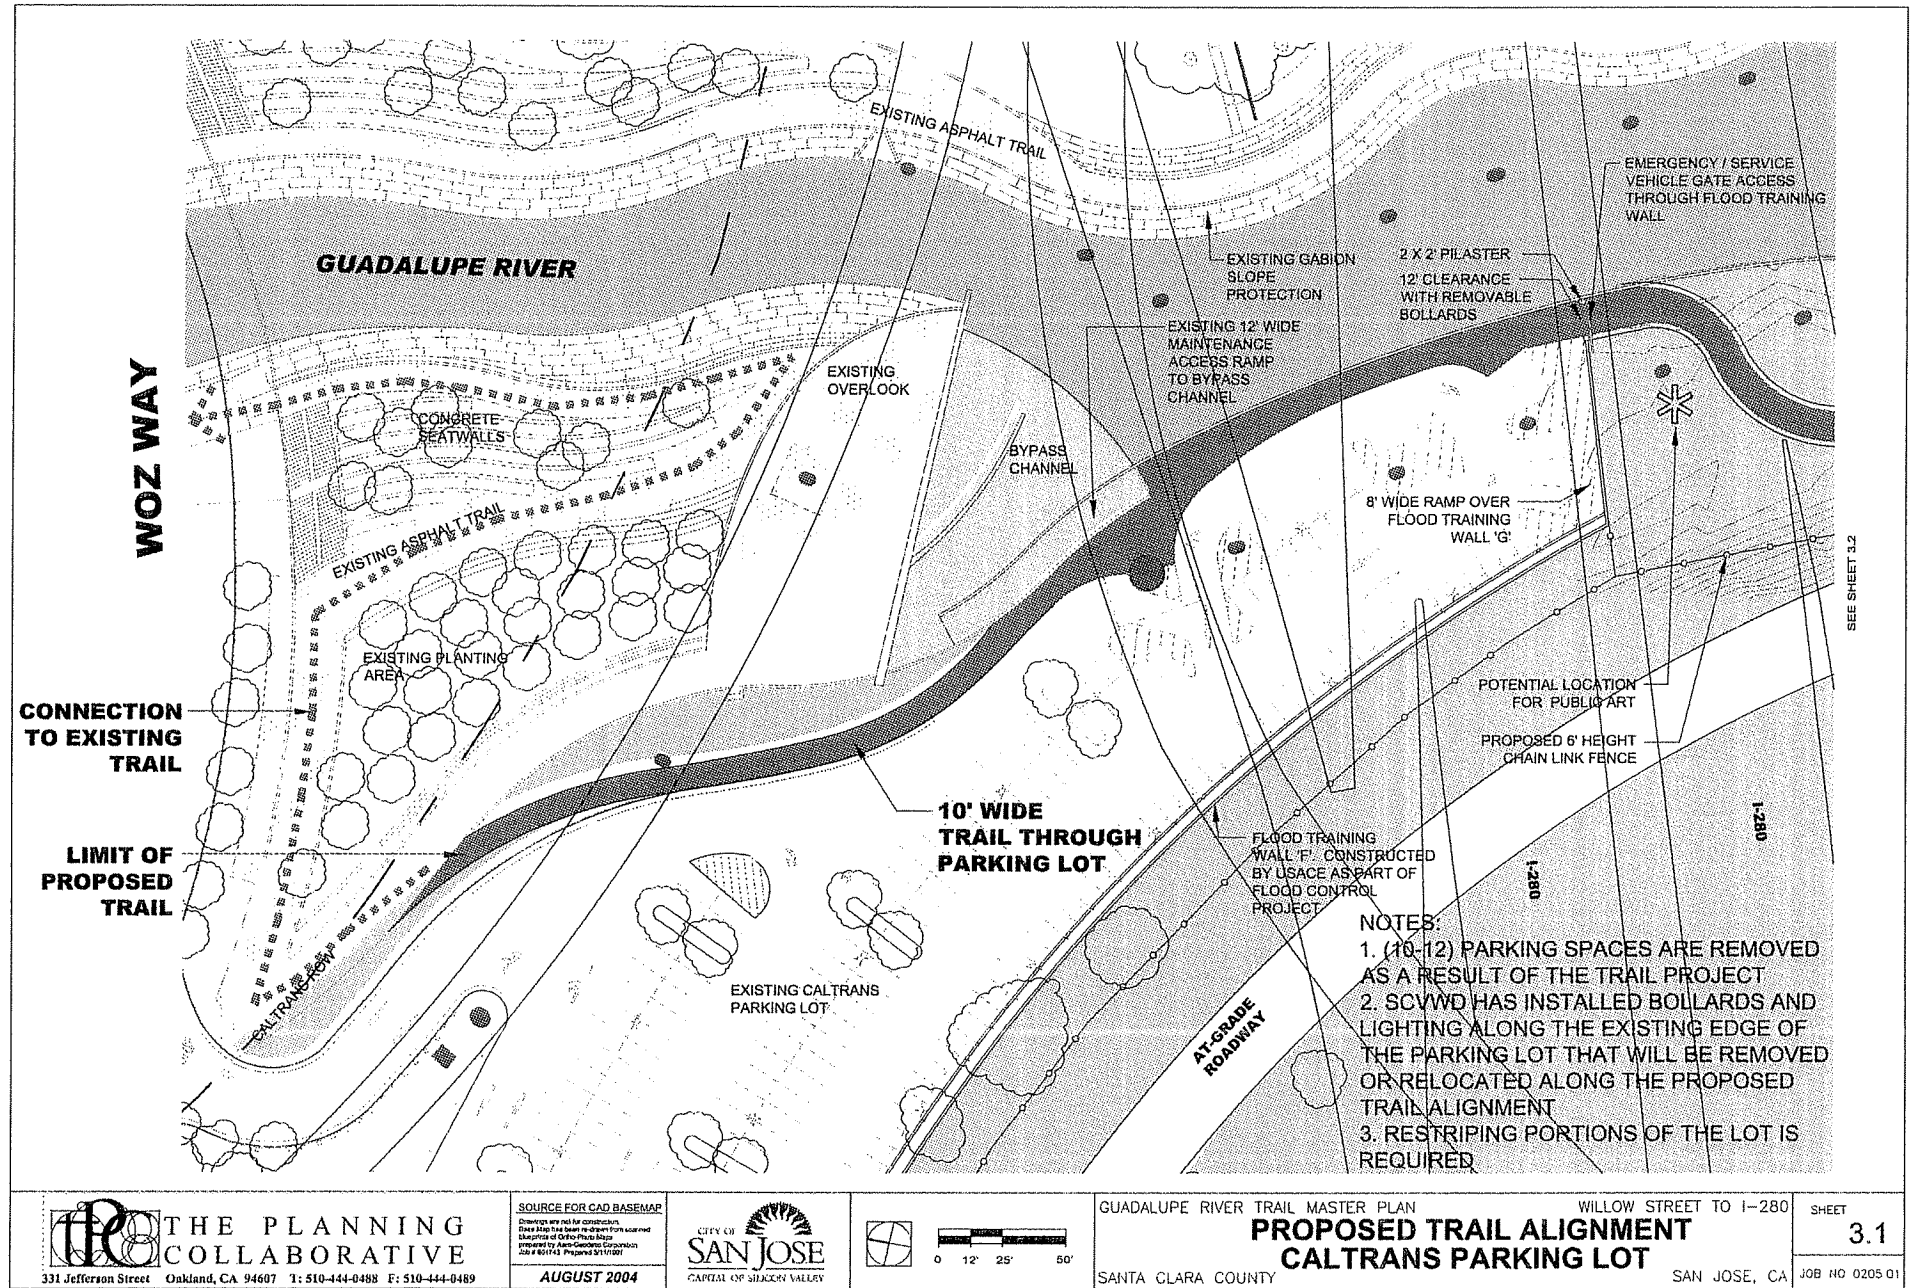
Proposed Trail Alignment- Caltrans Parking Lot
